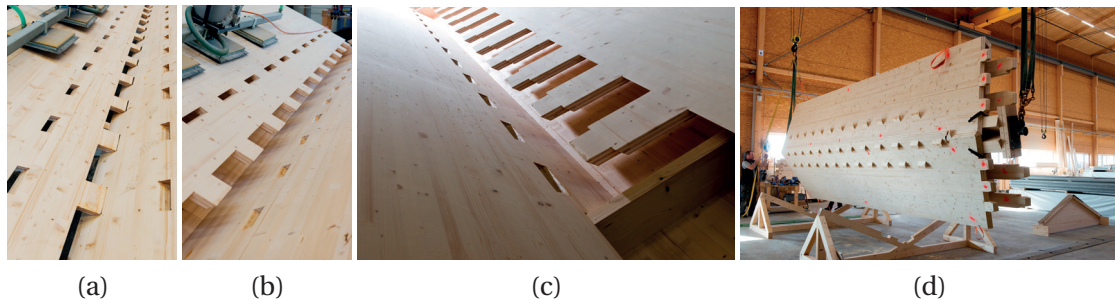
Vidy theater prefab [RGCW16] : (a) External wall layers, (b) Internal wall layer 1, (c) Internal wall layer 2 and (d) Prefab wall
